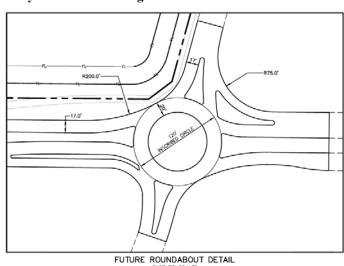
Preliminary Roundabout Design in Site Plan - Oakmont Drive at Lake Sharon Drive
